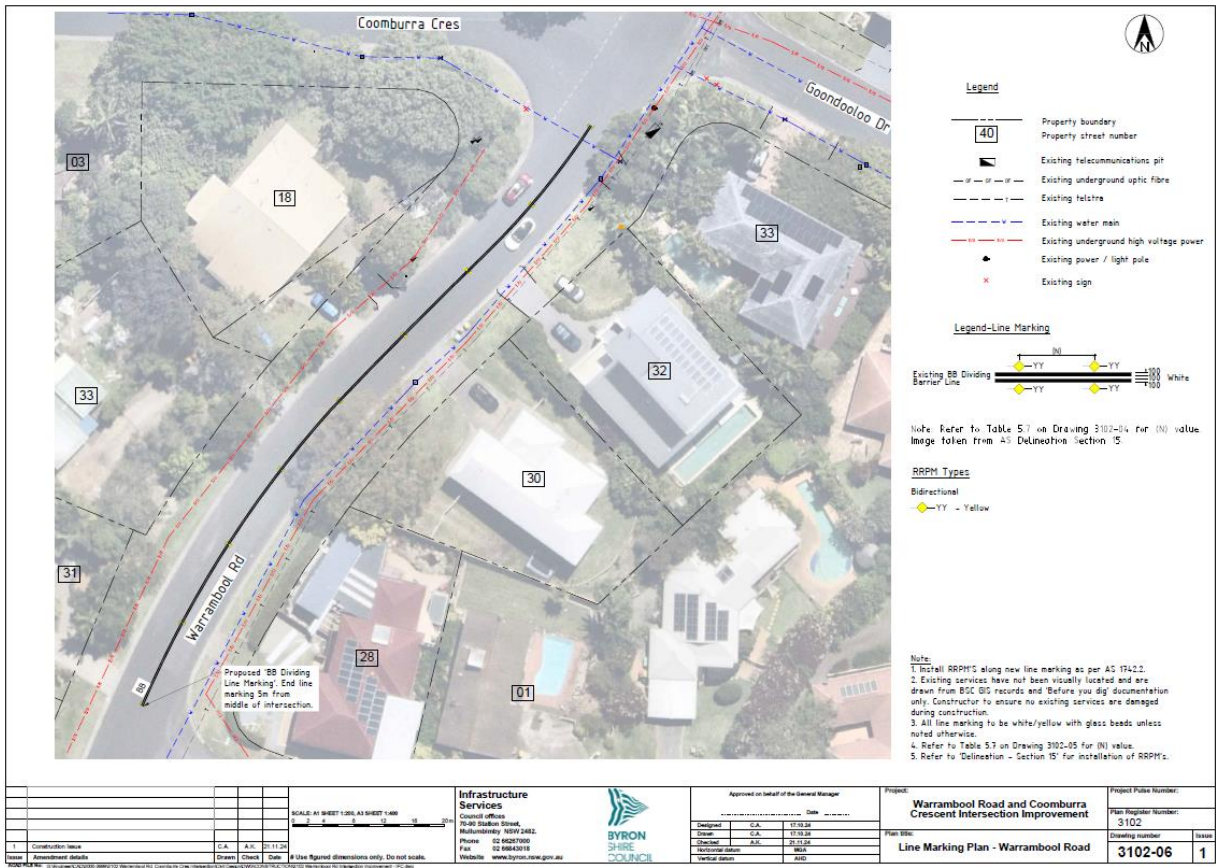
new proposed intersection layout (sheet 3 of 4)
